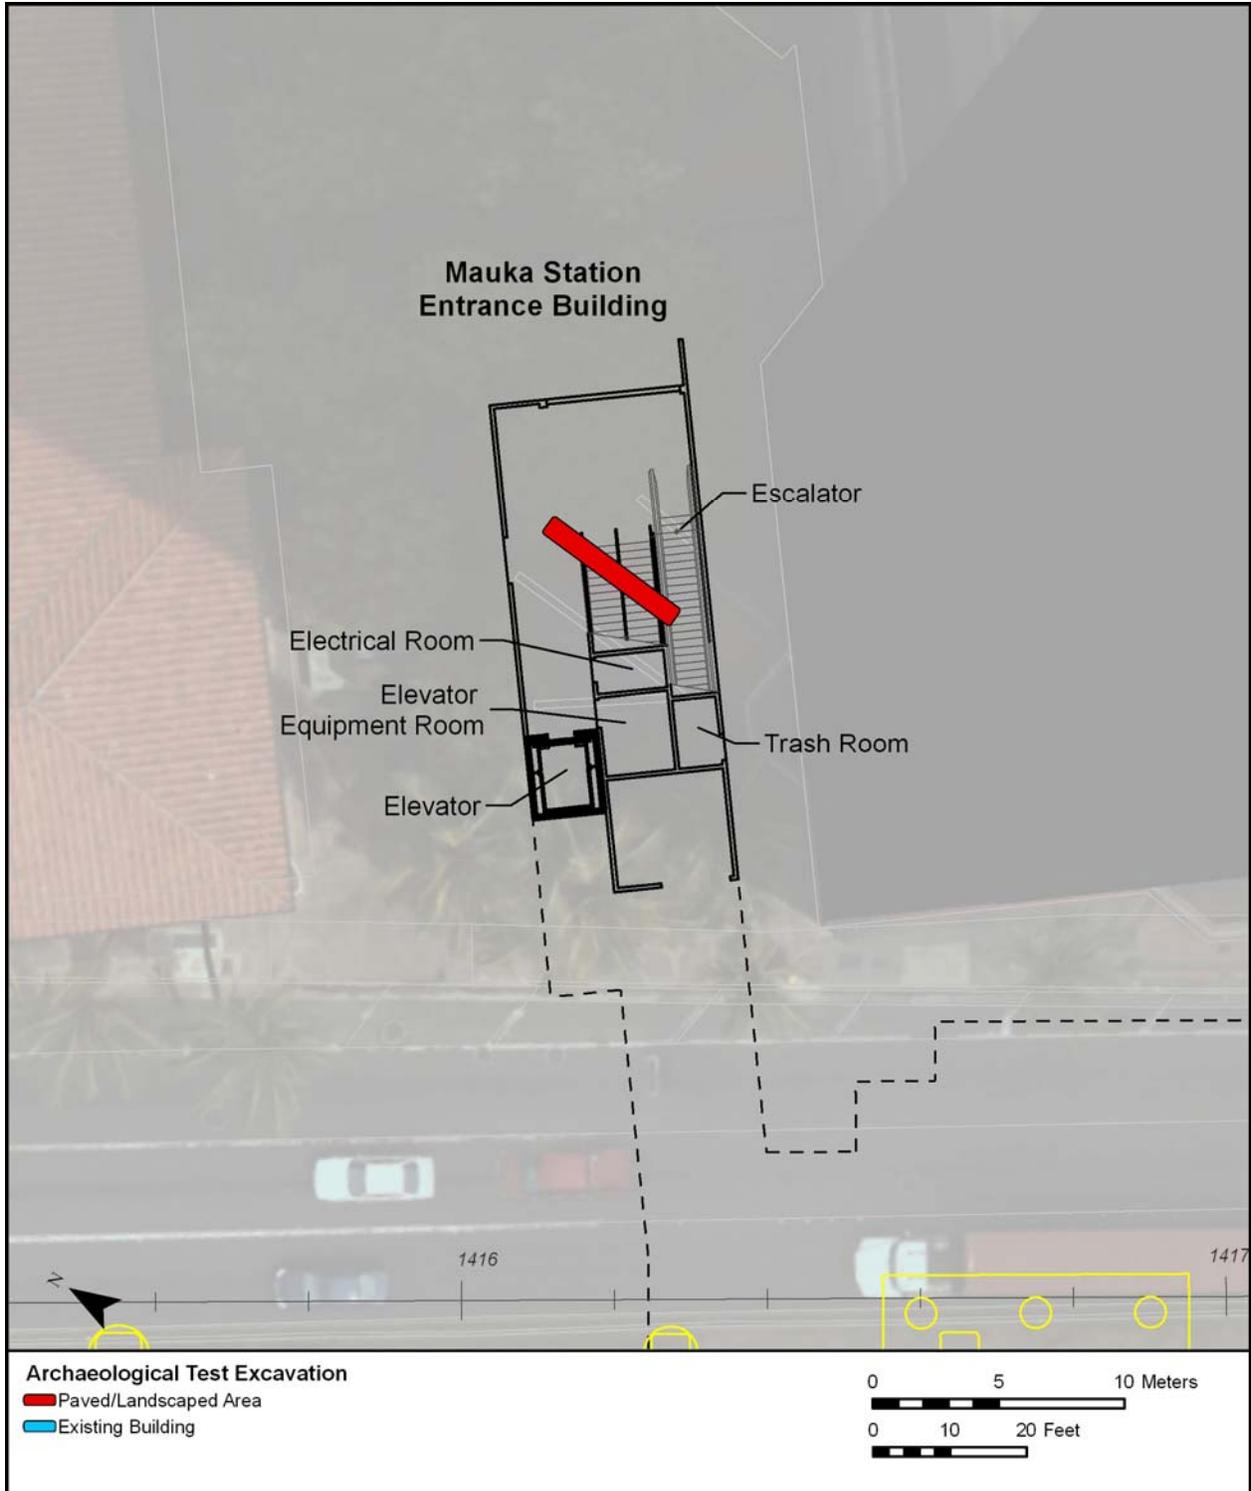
Downtown Station, detail of (*mauka*) Station Entrance Building at *mauka* side of Nimitz Highway showing proposed locations for archaeological inventory survey testing (one 2' by 20' test trench at (*mauka*) Station Entrance Building due to its location seaward of the former shoreline and constraints)
